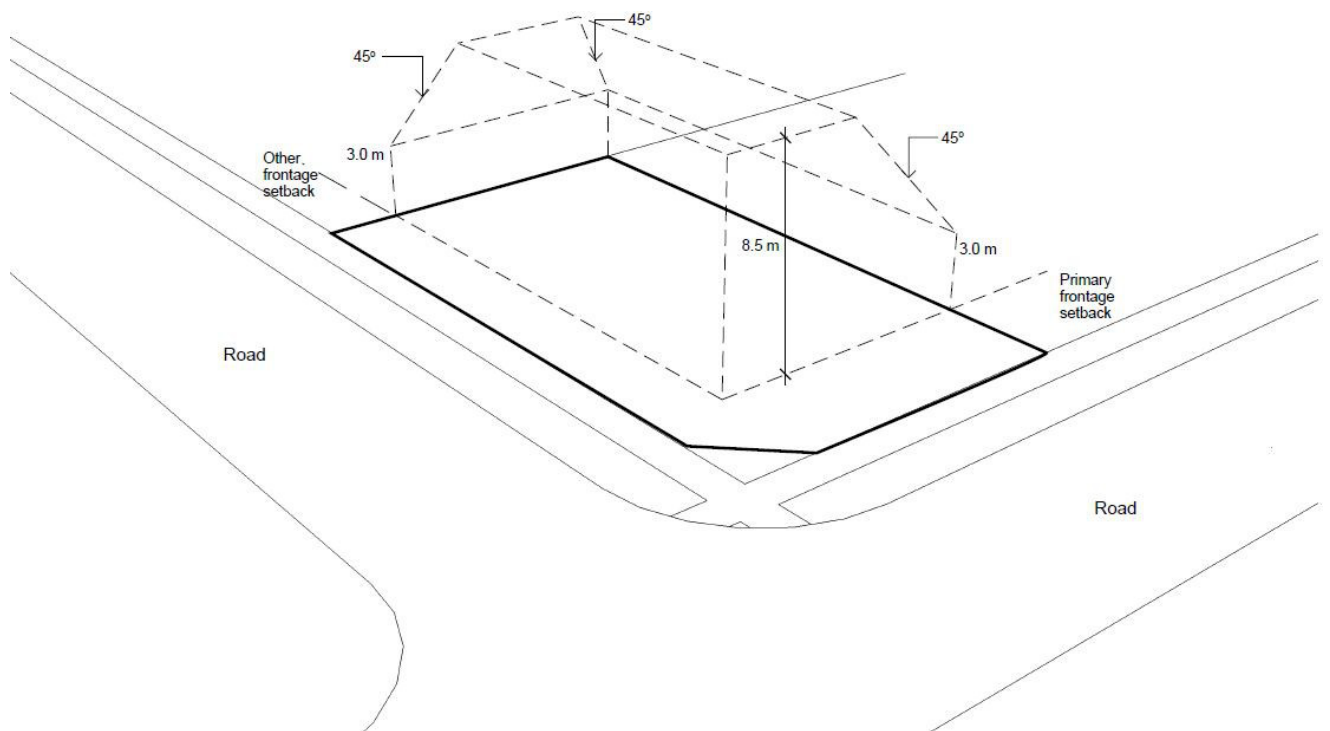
Building envelope for corner lots as required by clause 10.4.2 A3(a)
